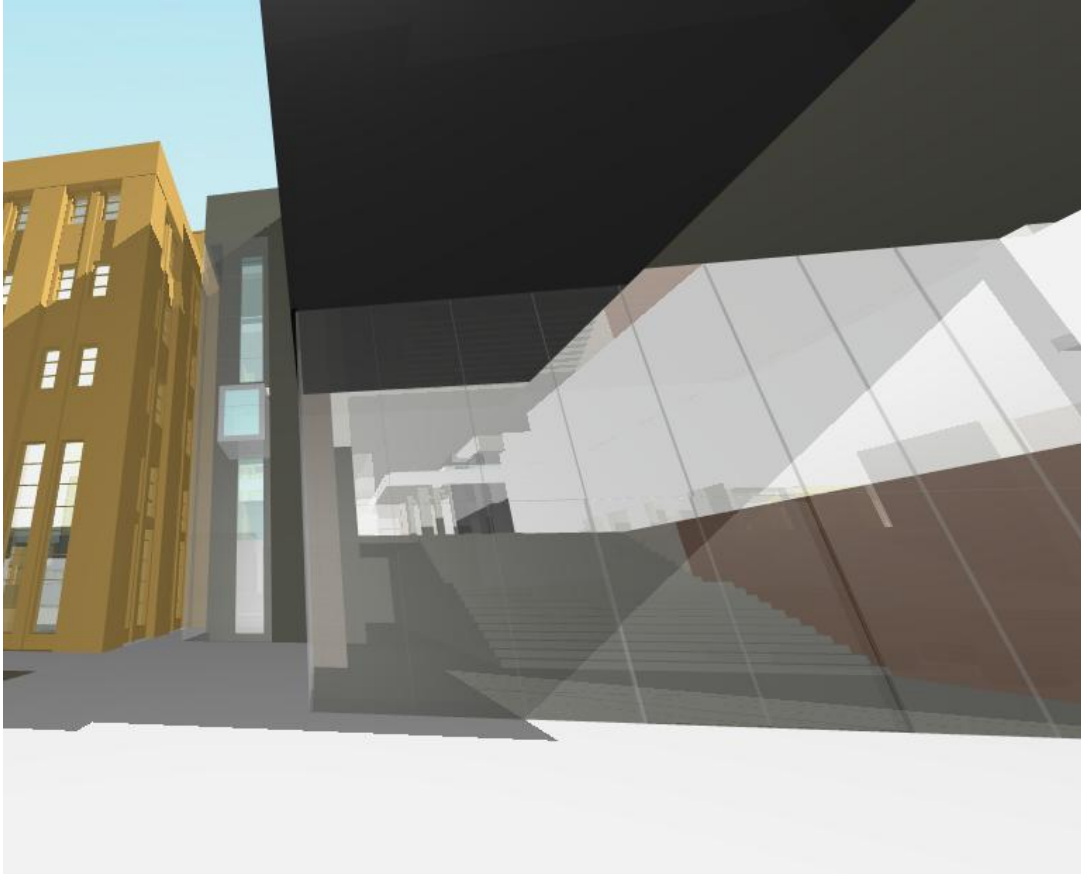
Detail of glass lift and connection to existing building, viewed from Circular Quay
